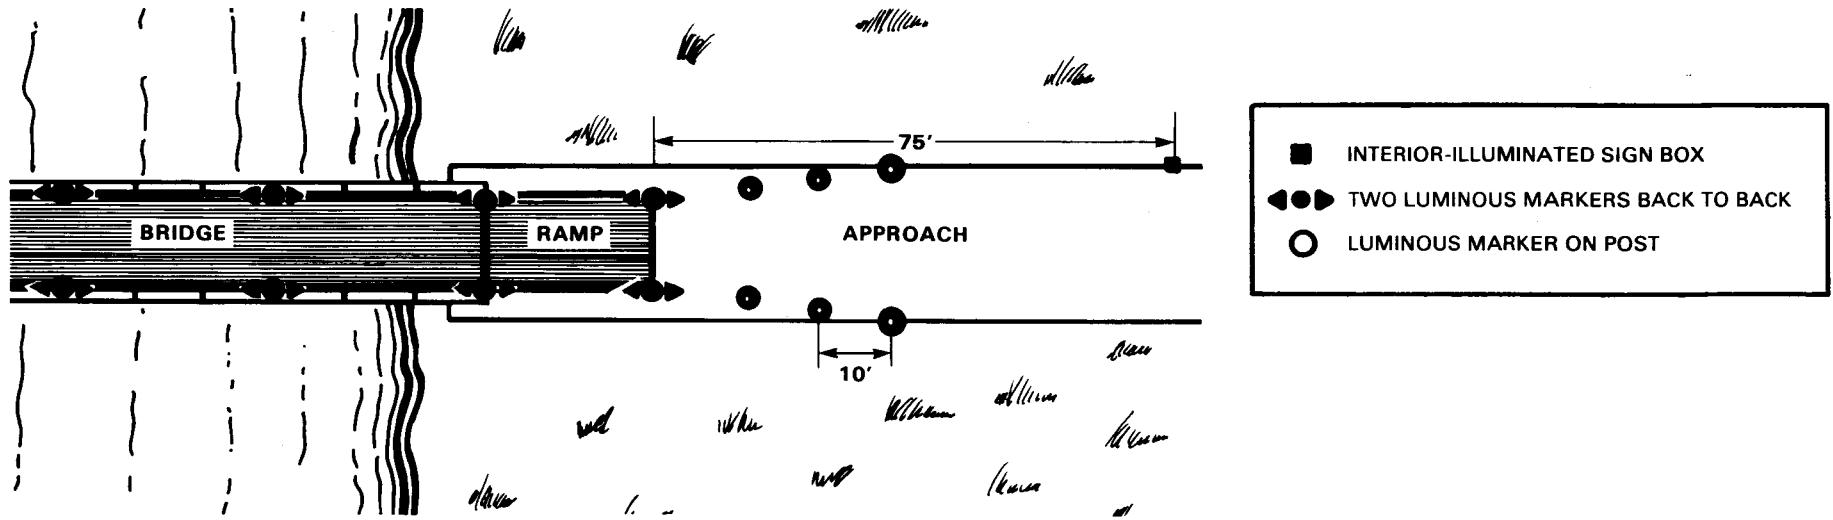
Arrangement of luminous markers on approach and on bridge
